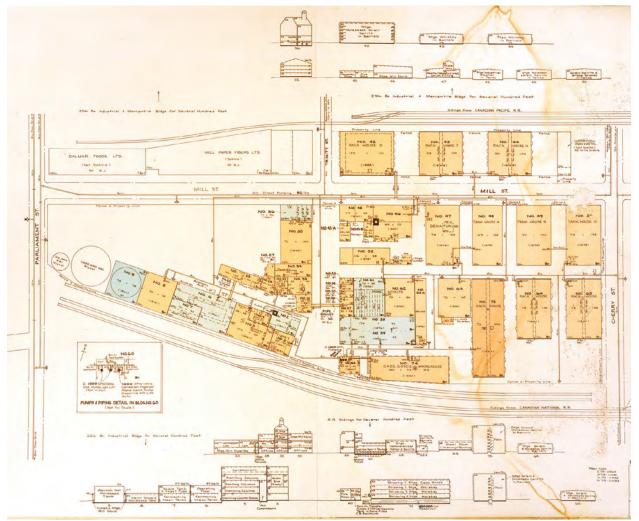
1980 SITE PLAN SHOWING BUILDING FOOTPRINTS, CONSTRUCTION MATERIALS AND INDUSTRIAL CONNECTIONS BETWEEN BUILDINGS. DIAGRAMS IN ELEVATION SHOW THE RELATIVE MASSING OF STRUCTURES AT THE TIME (DISTILLERYHERITAGE.COM; ACCESSED AT: HTTP://DISTILLERYHERITAGE.COM/MAPS_PAGE2.L).
